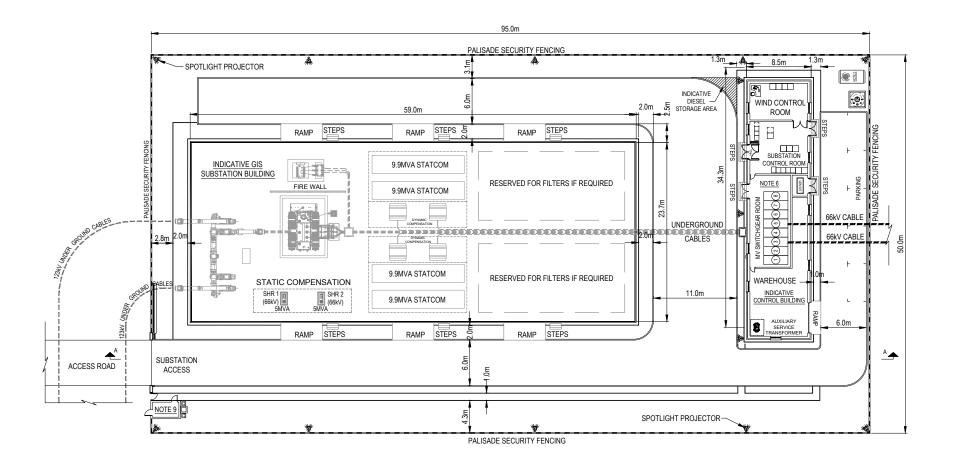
E 6: Layout Plan: Indicative AIS Enclosed Substation (Option B) (FLO-WHI-LAY-0003)
